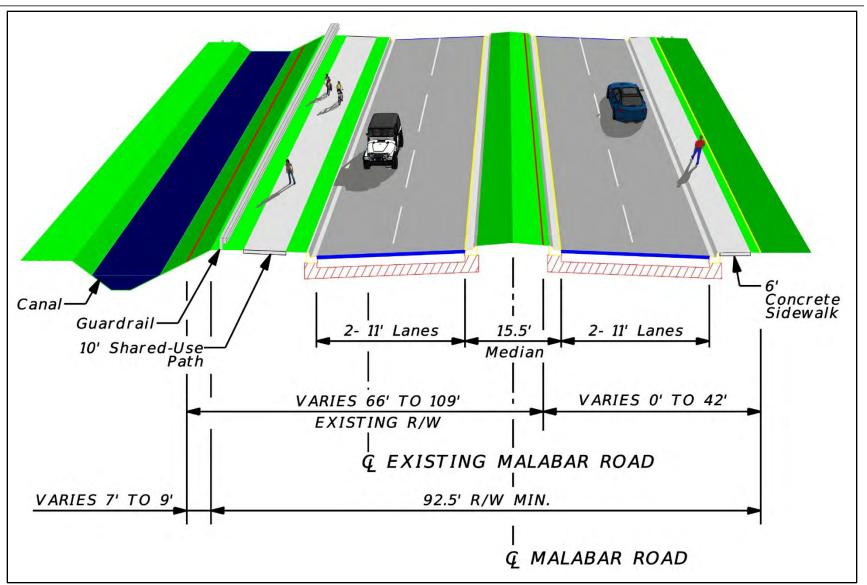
92.5' Alternative A – Canal C-10 to Sta. 256+80
